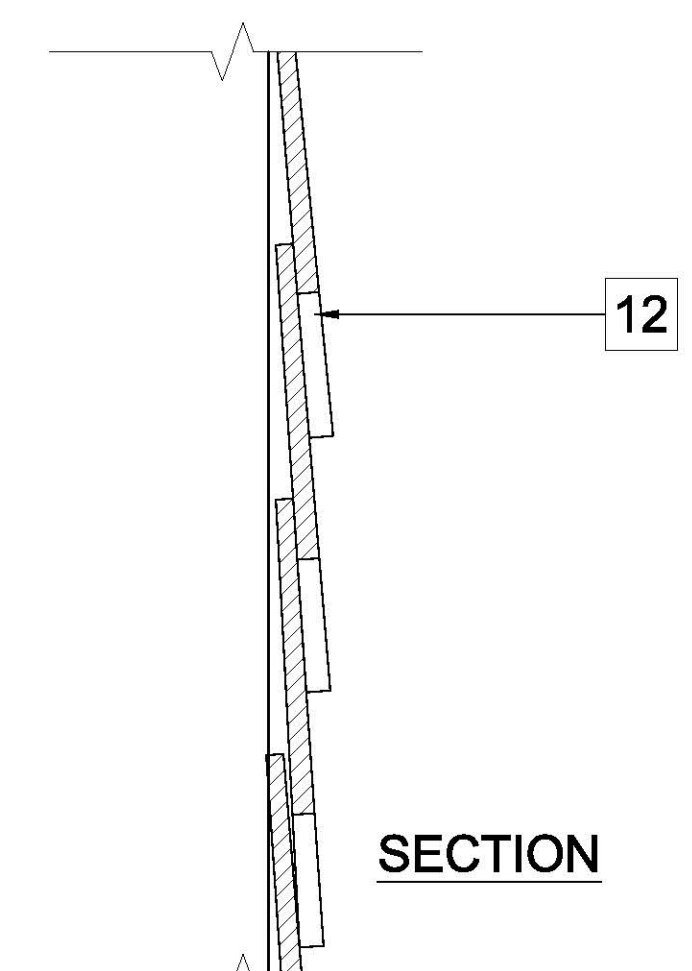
DETAIL F - HORIZONTAL T&G WOOD SIDING
